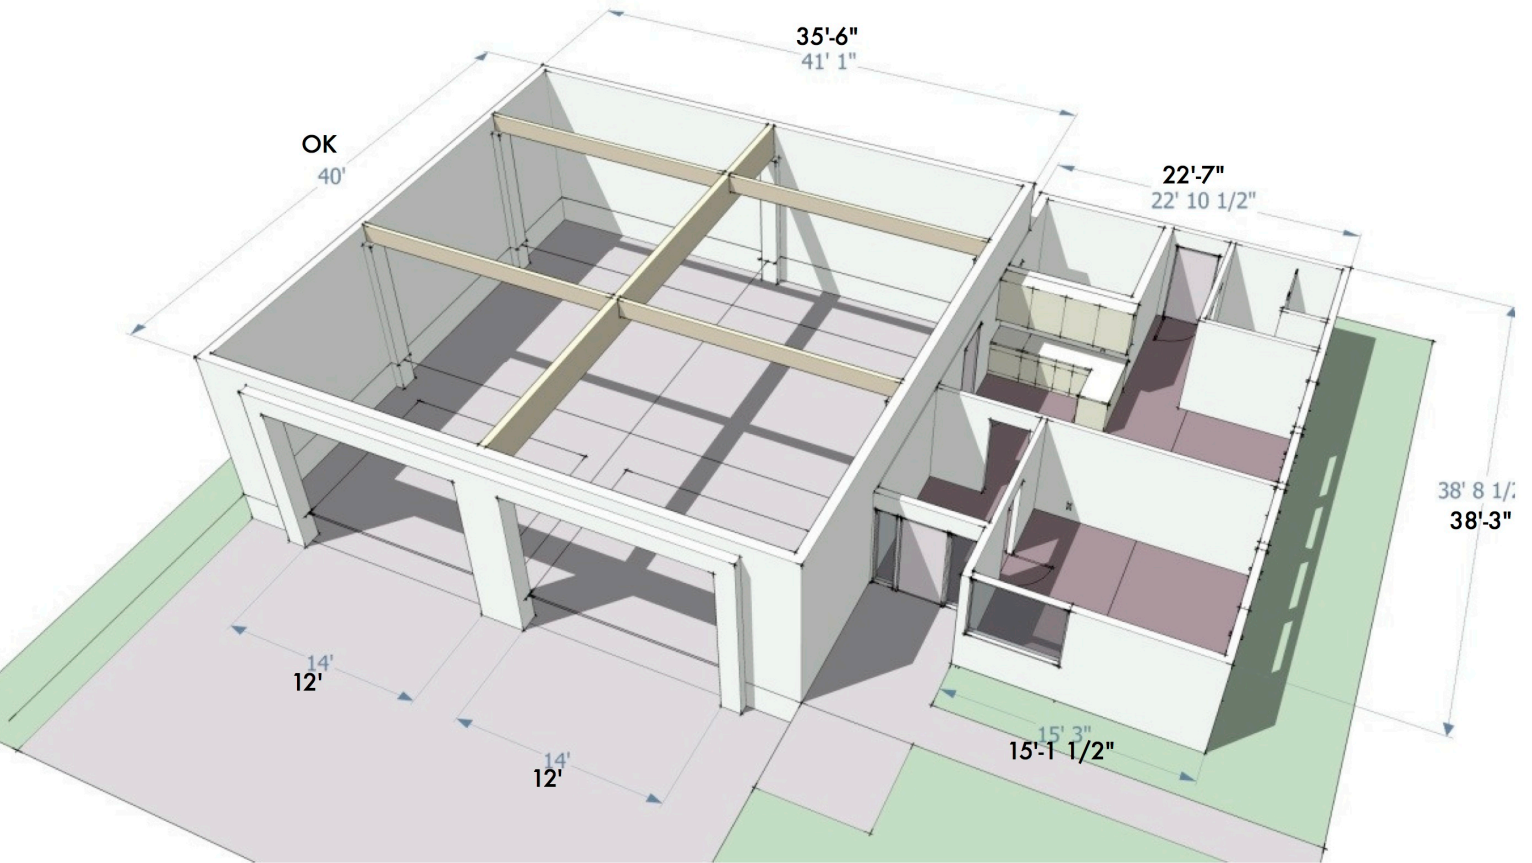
Axonometric rendering of the existing Station Building 1 in 2010
